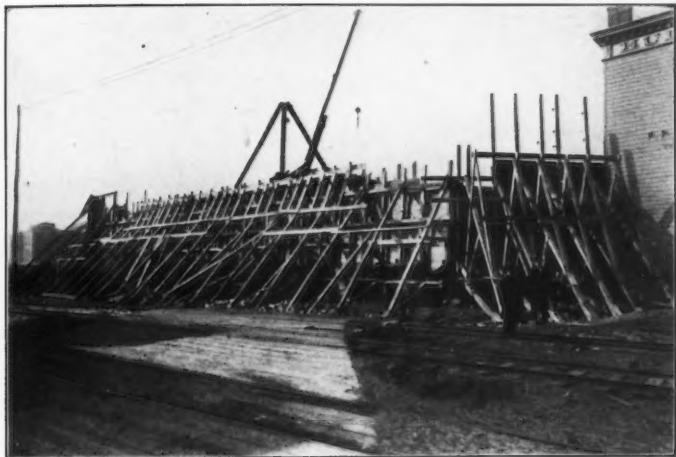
FORM WORK FOR MASONRY OF NORTH ABUTMENT, THOMSON AVE. BRIDGE.
